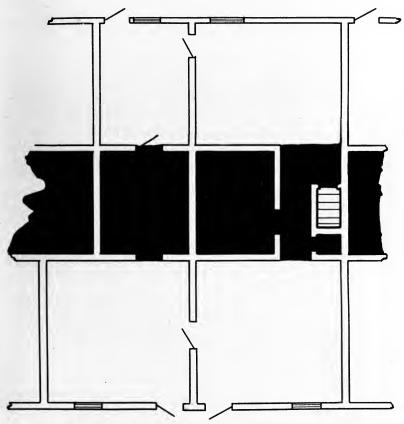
Plate VIII. Typical floor plan showing dark basement rooms in one section of building shown in Illustrations 2 and 3. Children sleep in many of these dark rooms.
